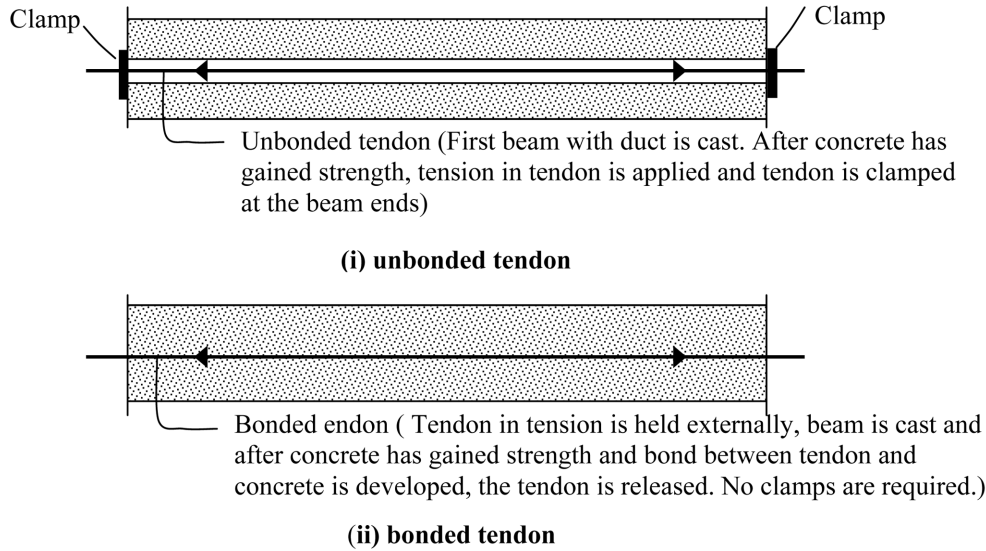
(a) Schematic representation of unbonded and bonded tendon in a concrete beam
